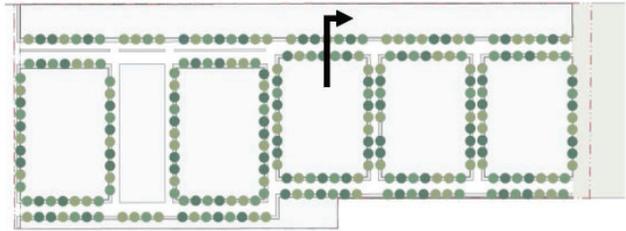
Northern East-West Street - 74-foot Right of Way - Northern
